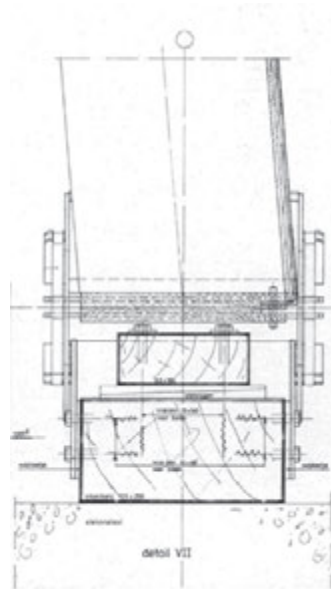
Detail showing how the members were connected to the ground, 1992
